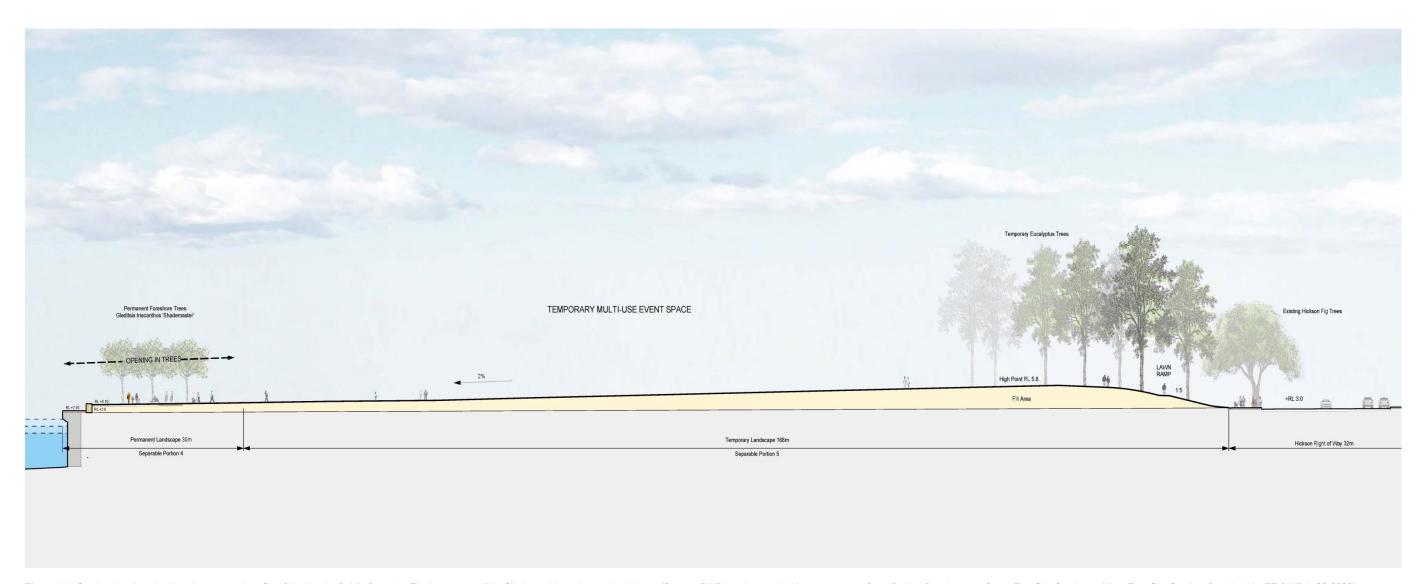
Section drawing showing the proposed profile of the Interim Public Domain. The lawn area will be filled to achieve the required slope. (Source: PWP Landscape Architecture, extract from 'Design Development Stage Two Site Sections—West East Site Section, Drawing No. TE-PWP-L-S3-8002)
